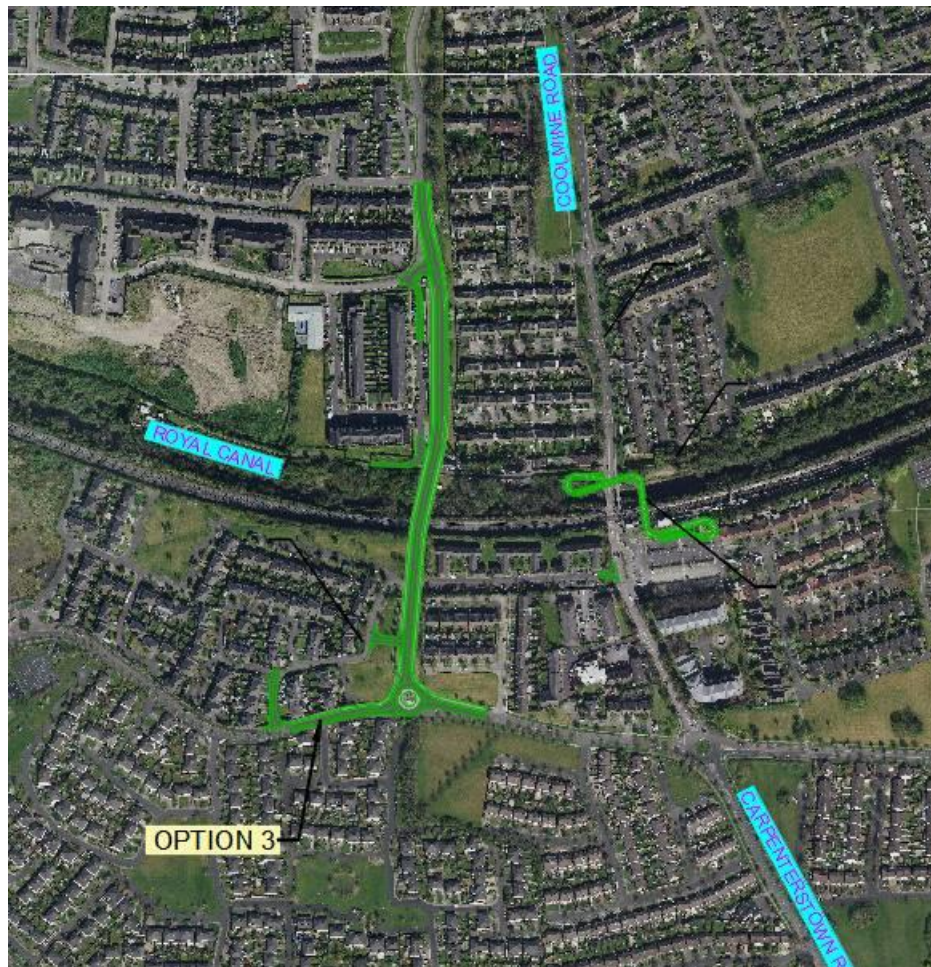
Coolmine Option 3 – New overbridge connecting St. Mochta’s Grove to Lutterallpark Road (Copyright Ordnance Survey Ireland – 0039720)
